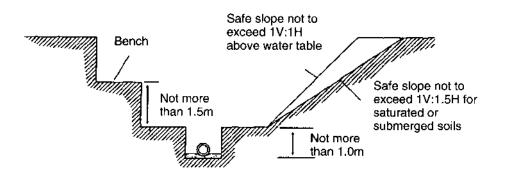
Excavation Face Benched and Battered to a Safe Slope
